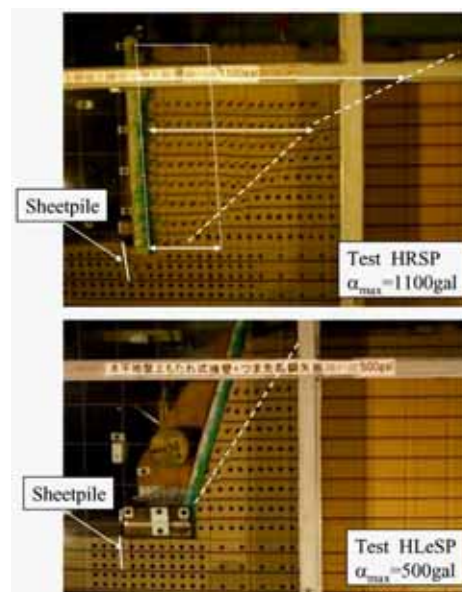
Failure plane formation in backfill layer (HRSP and HLeSP)
